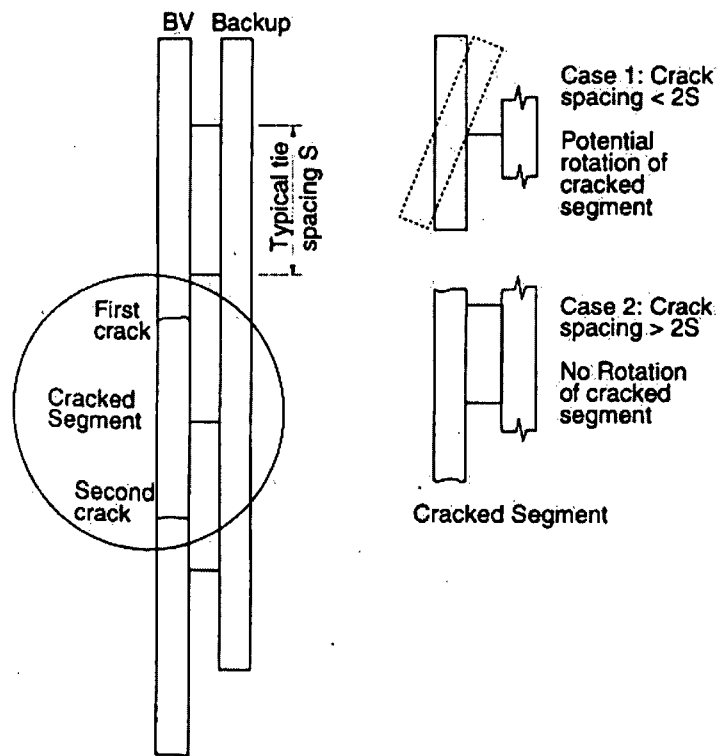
Potential instability of cracked veneer for large tie spacing. (From Ref. 16)
